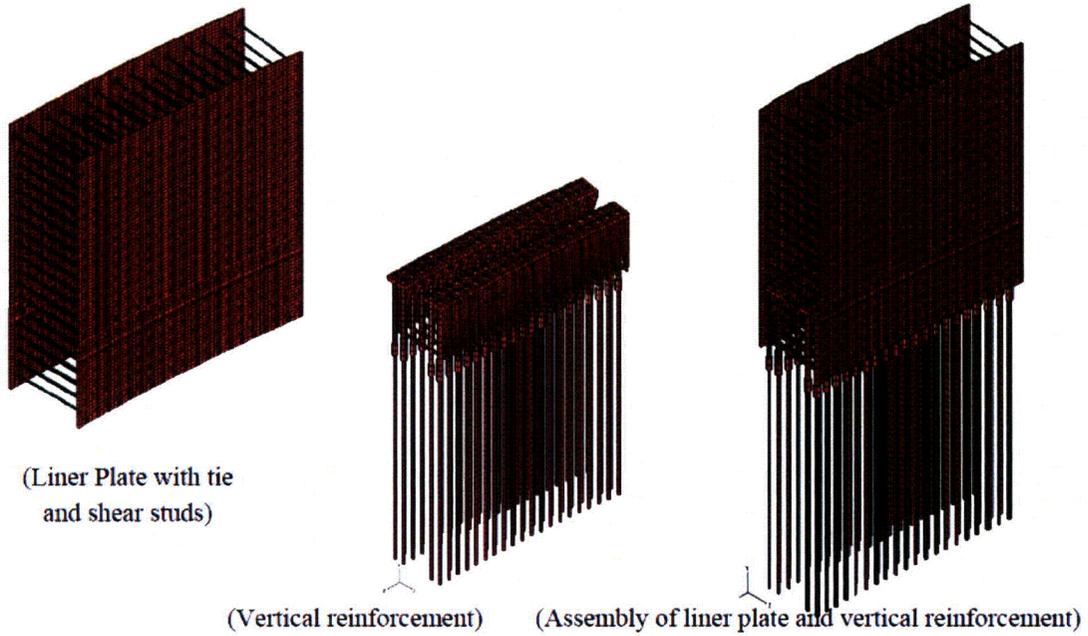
SEB1-03-47: Level 3 RC/SC Reinforcement Layout
